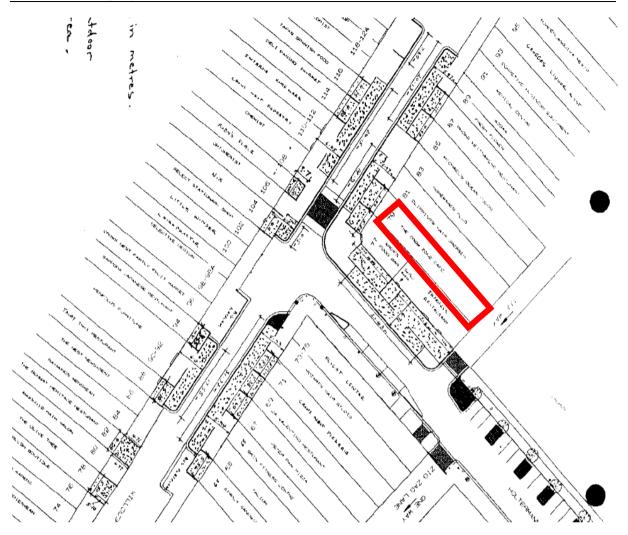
Approved Outdoor Dining Plan (1999) / Subject Site marked in red
